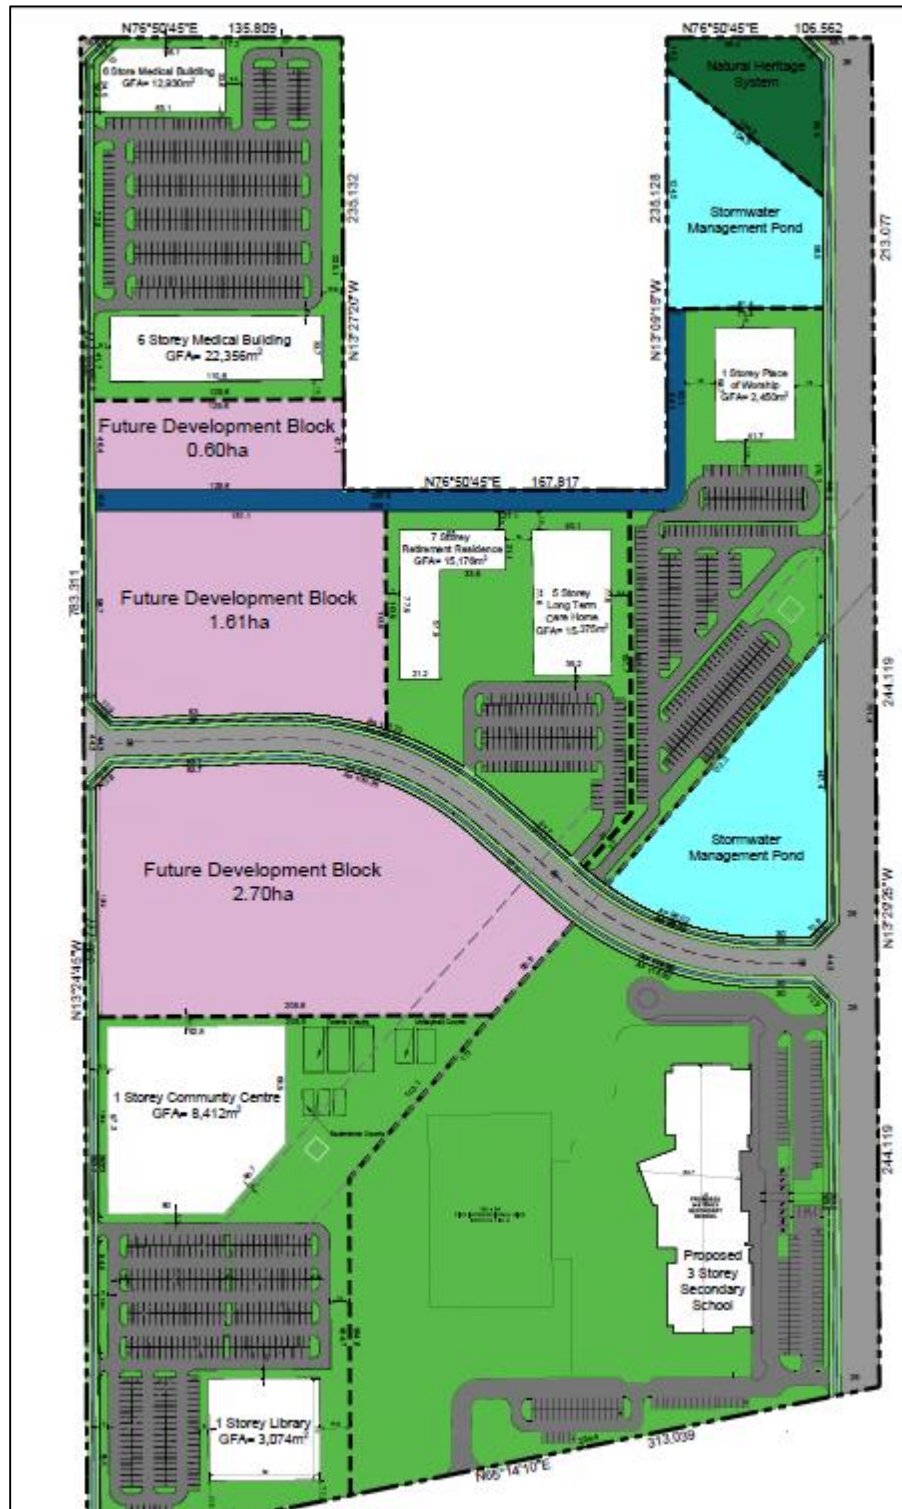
Proposed development of 700 Garner Road East, as submitted through a current Subdivision Application (from Concept Plan prepared by MHBC Planning)
